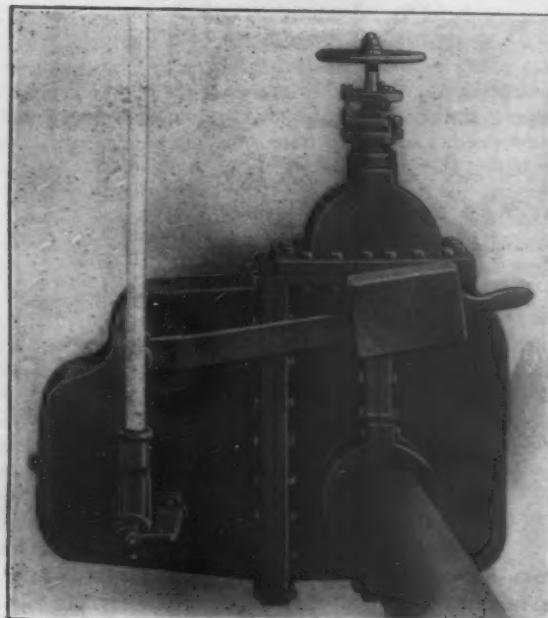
The Machine in Readiness to Cut the Pipe.
